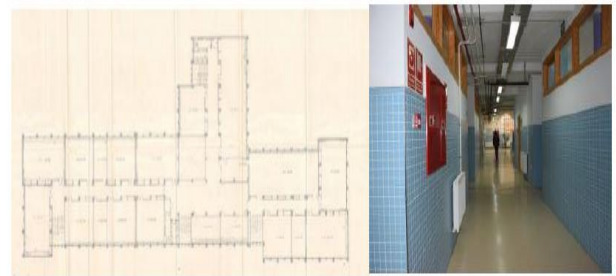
Typical school building plant distribution. a) Left plant, b) right corridor window (Maite et al, 2017)
